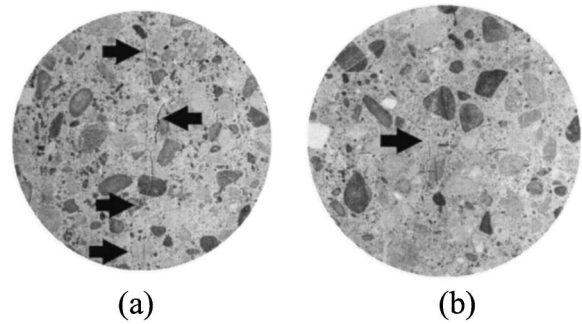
Diagram of: (a) multiple cracking in steel 1% specimen cracked to 500 μm ; (b) single central crack in unreinforced specimen cracked to 500 μm
